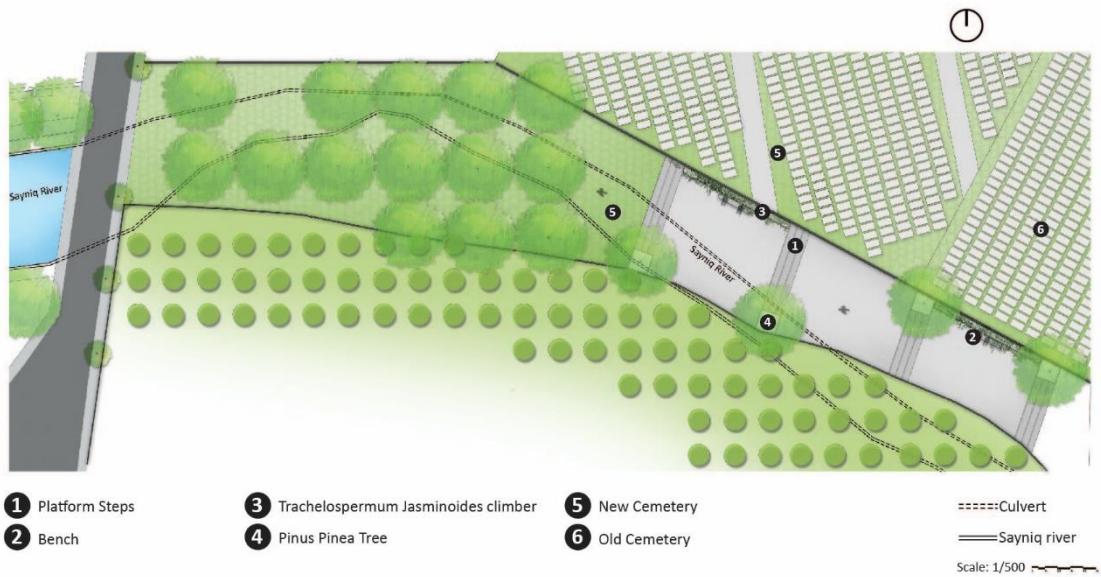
Ein El Helweh Reflection Garden, Site 2, Plan. Source: Author
